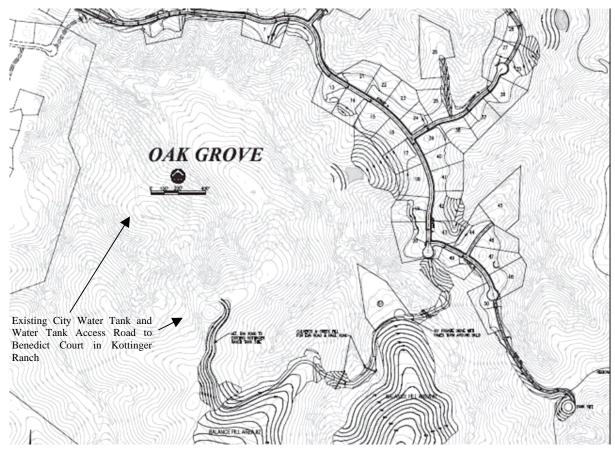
Fire Access Road from the City Water Tank/Benedict Court to A Street
